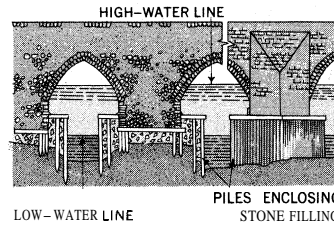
ARCHES OF OLD LONDON BRIDGE
